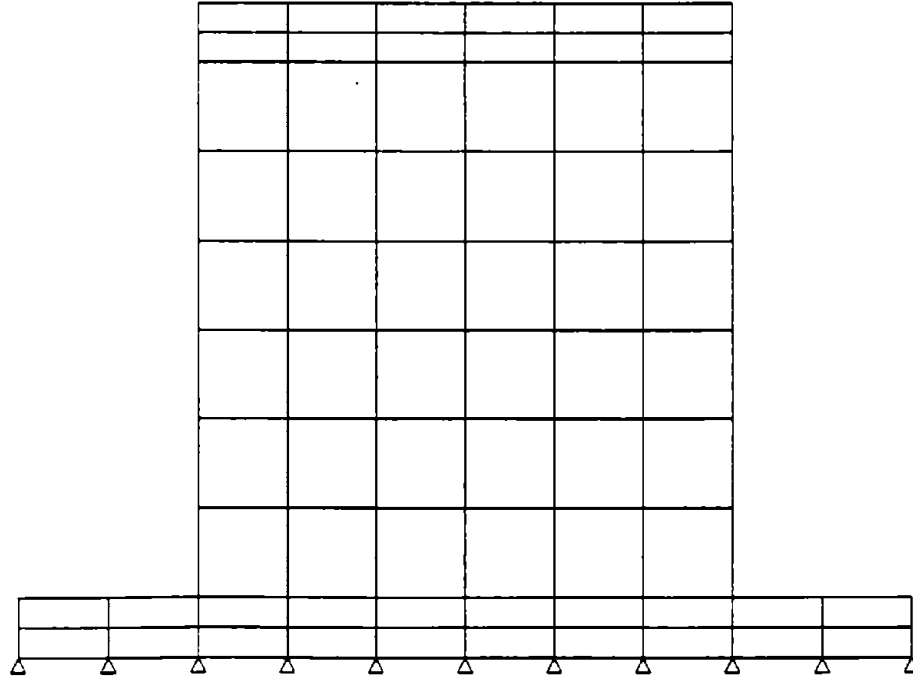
Finite Element Mesh For One-Story Reinforced Masonry Walls.
